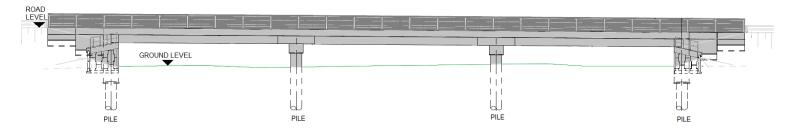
Elevation of the flood alleviation bridge in the proposed change
